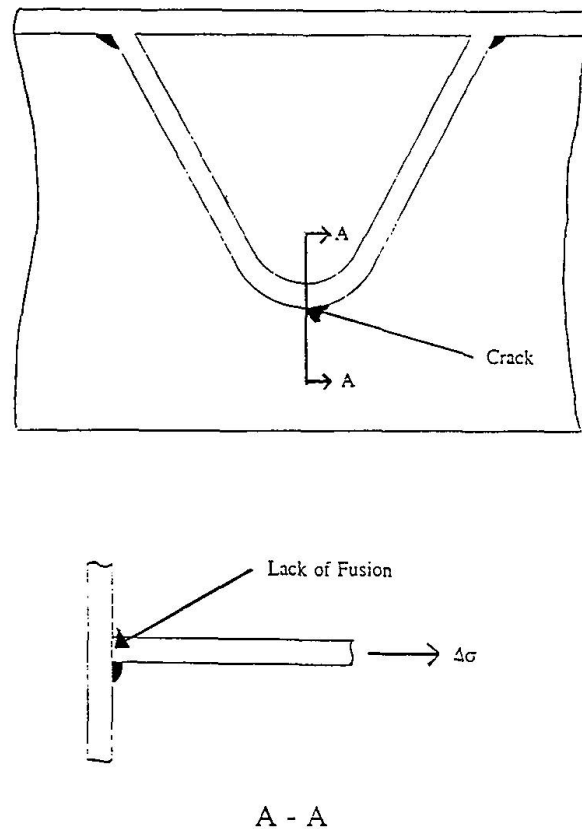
Fillet-welded connection of rib which is not continuous through the diaphragm
